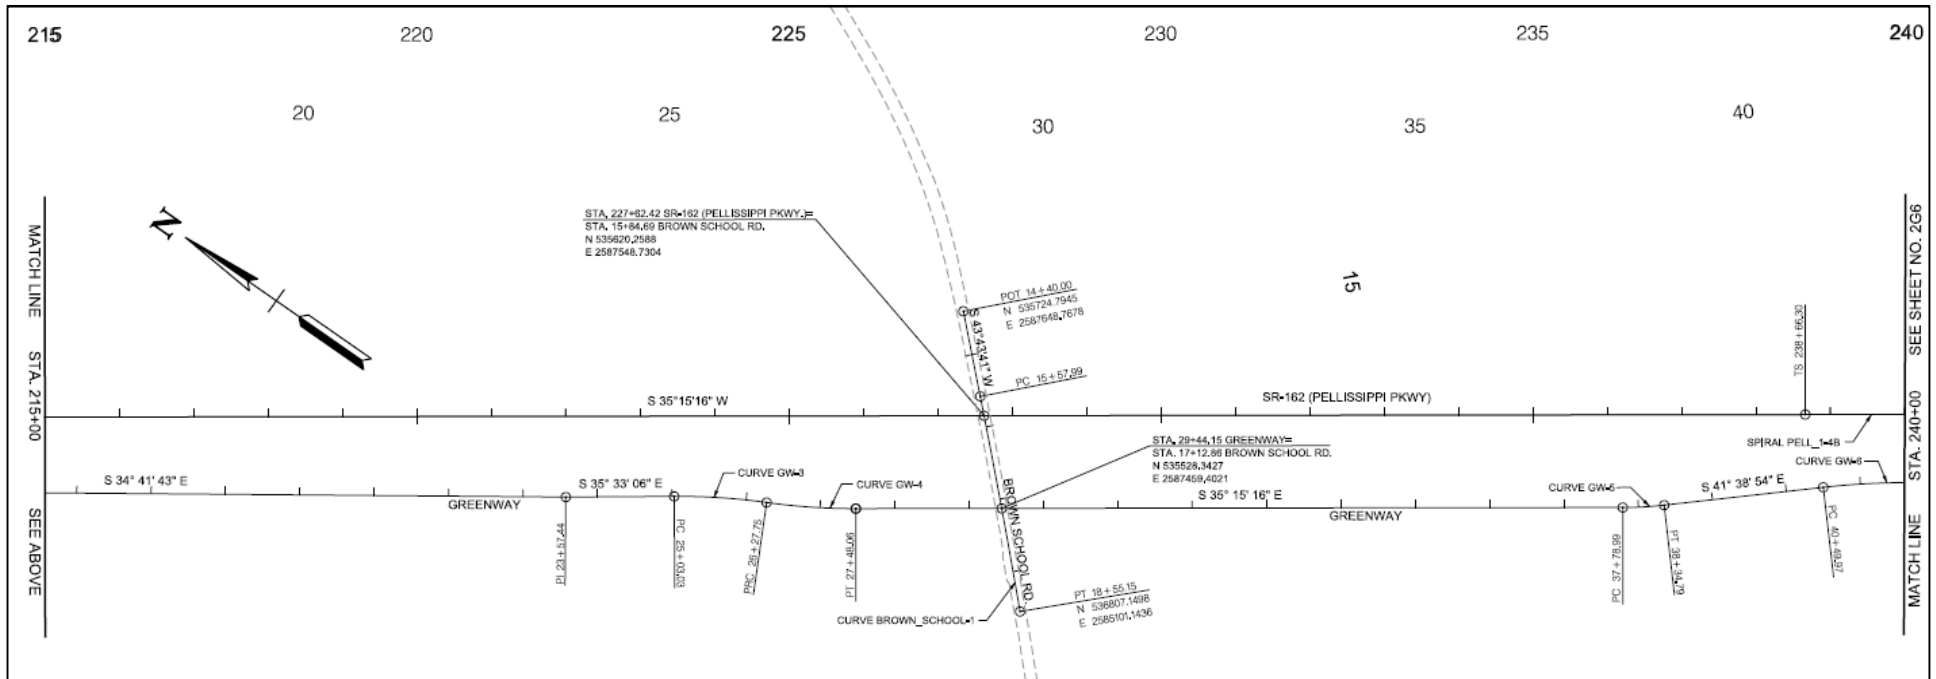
Overview 5 of 11 of the SR-162 Road Extension project from north to south.
